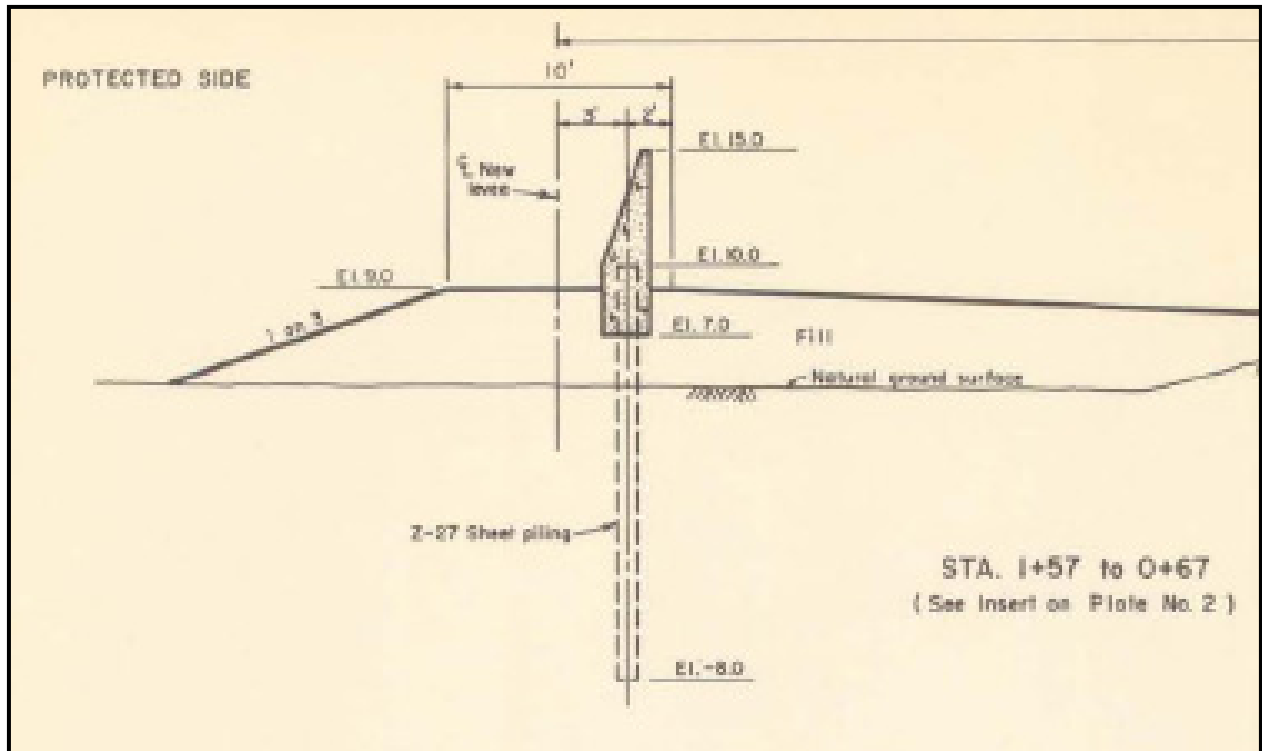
Pre-Katrina I-wall Design Section for Reach STB2 (Depicts authorized elevations, not actual elevations)
